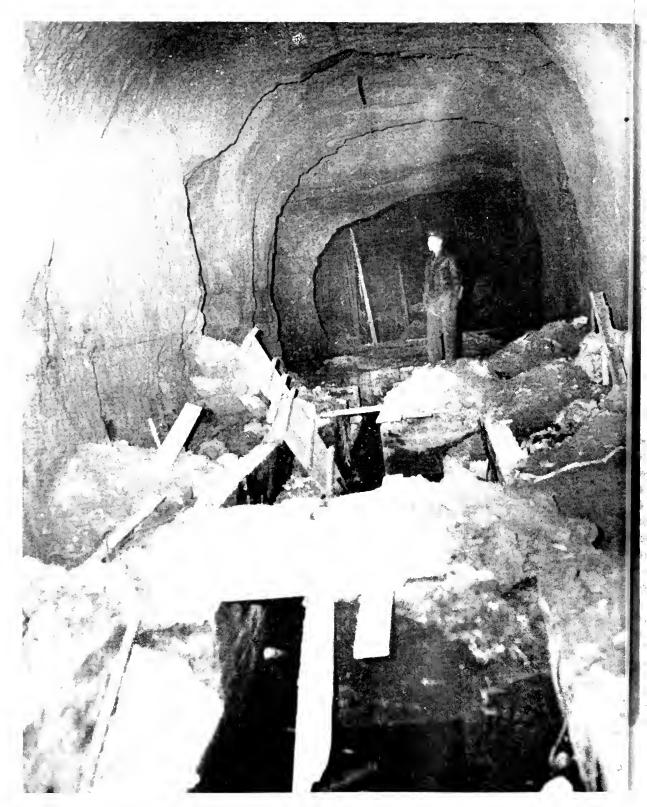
Heat treatment pits under construction, Yoshimatsu.
